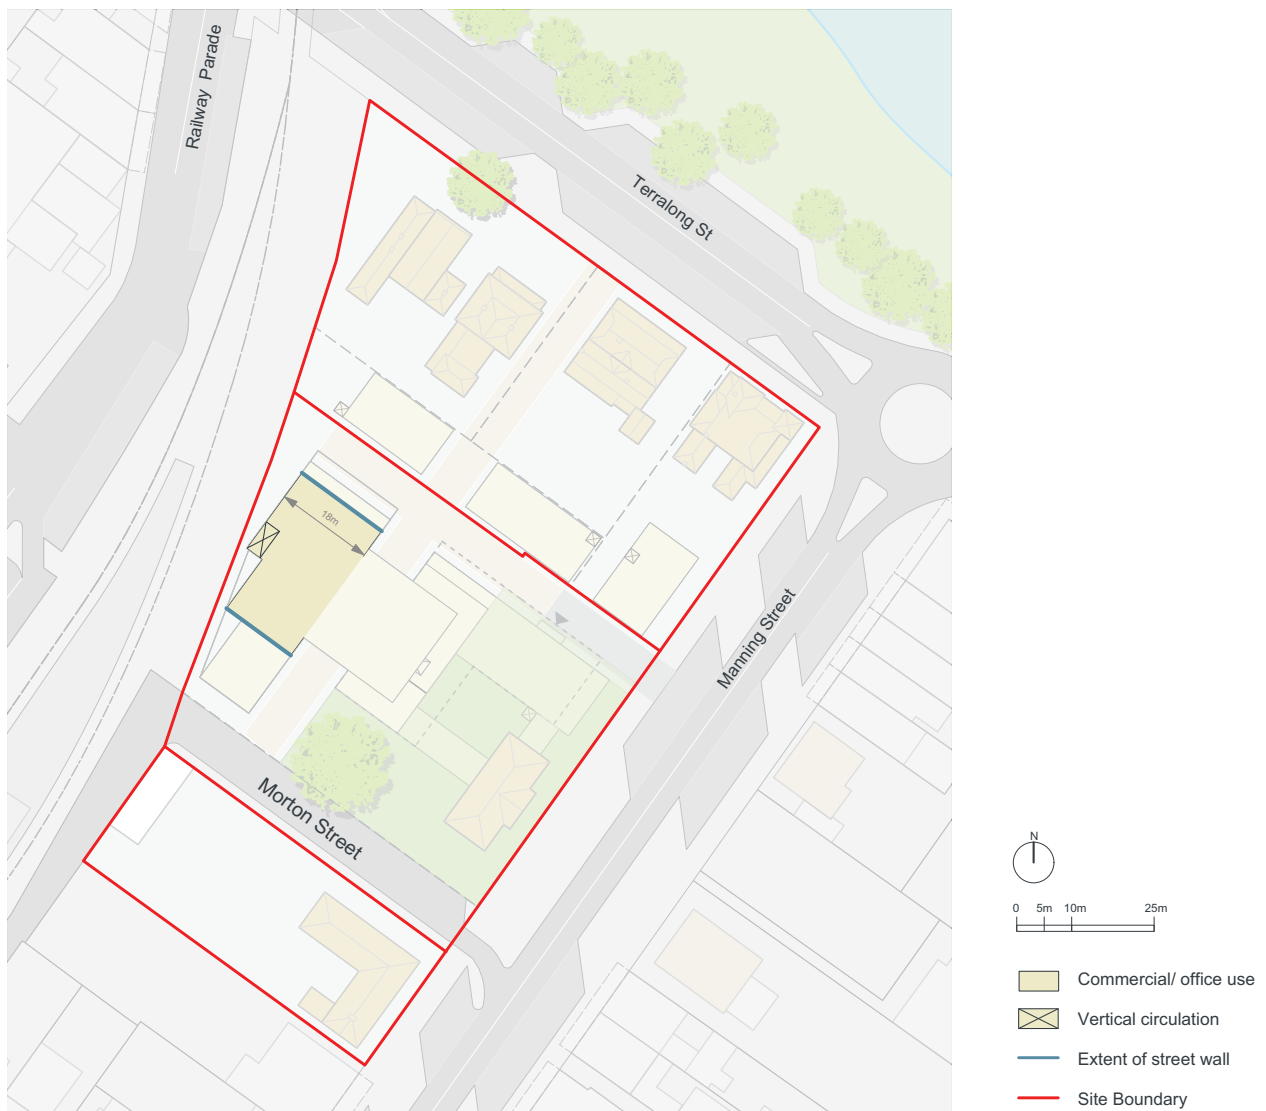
Civic Precinct - Site Layout Plan Levels 3 and 4
